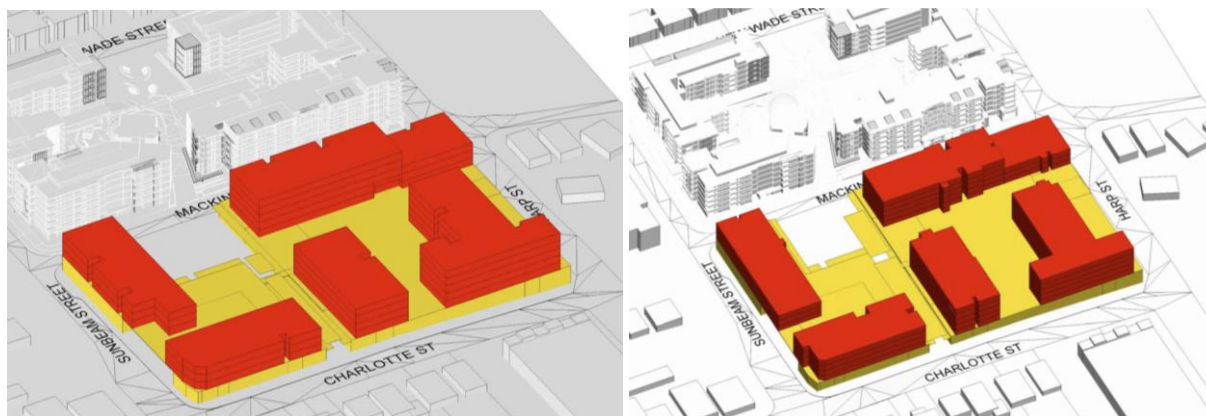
Envelope Study comparing the likely approved and proposed building envelopes (looking west)
